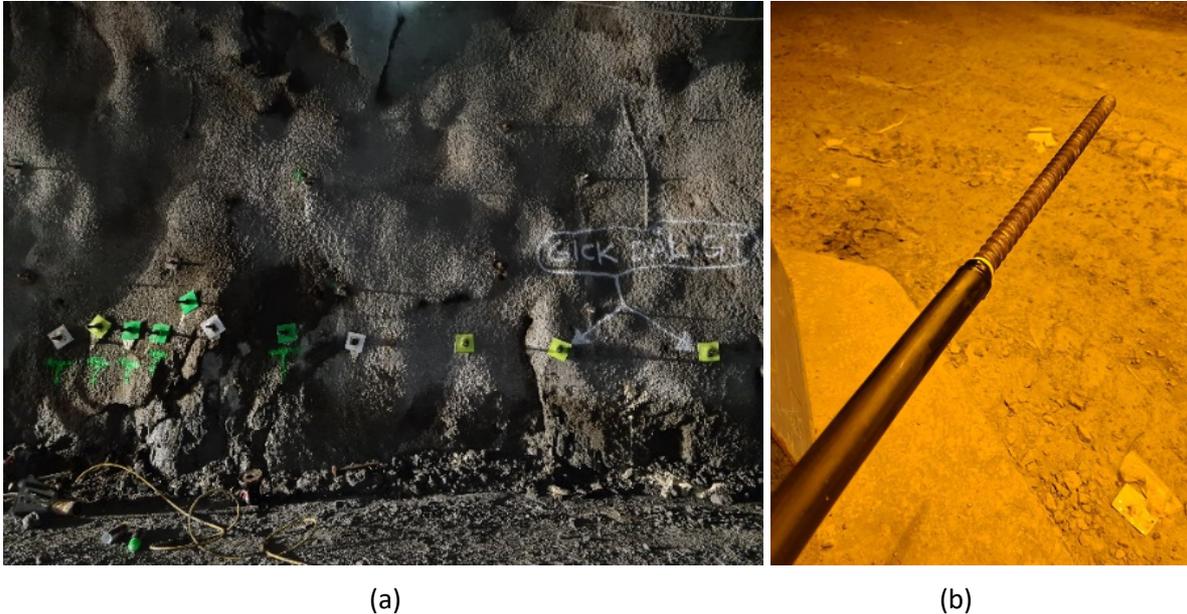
Test #1. (a) Installed bolts; (b) Decoupling method used
